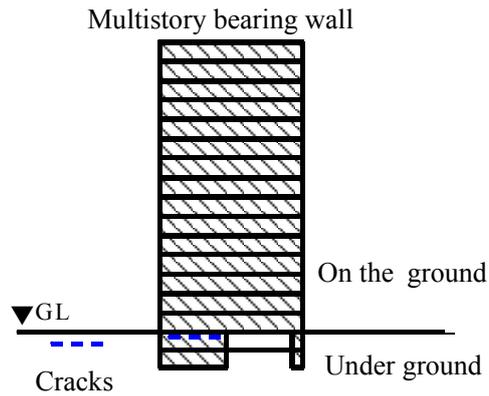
Schematic illustration of multistory bearing wall with large opening at basement
